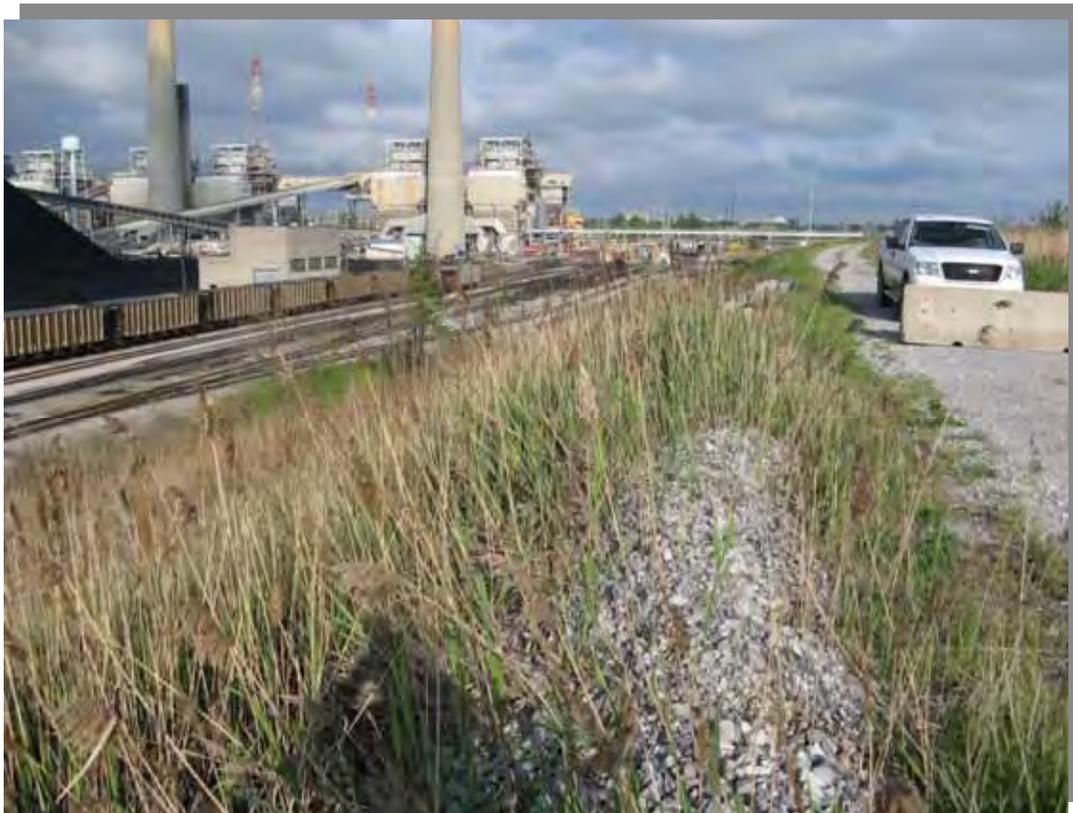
Outboard slope of southern embankment of Southern Pond.
